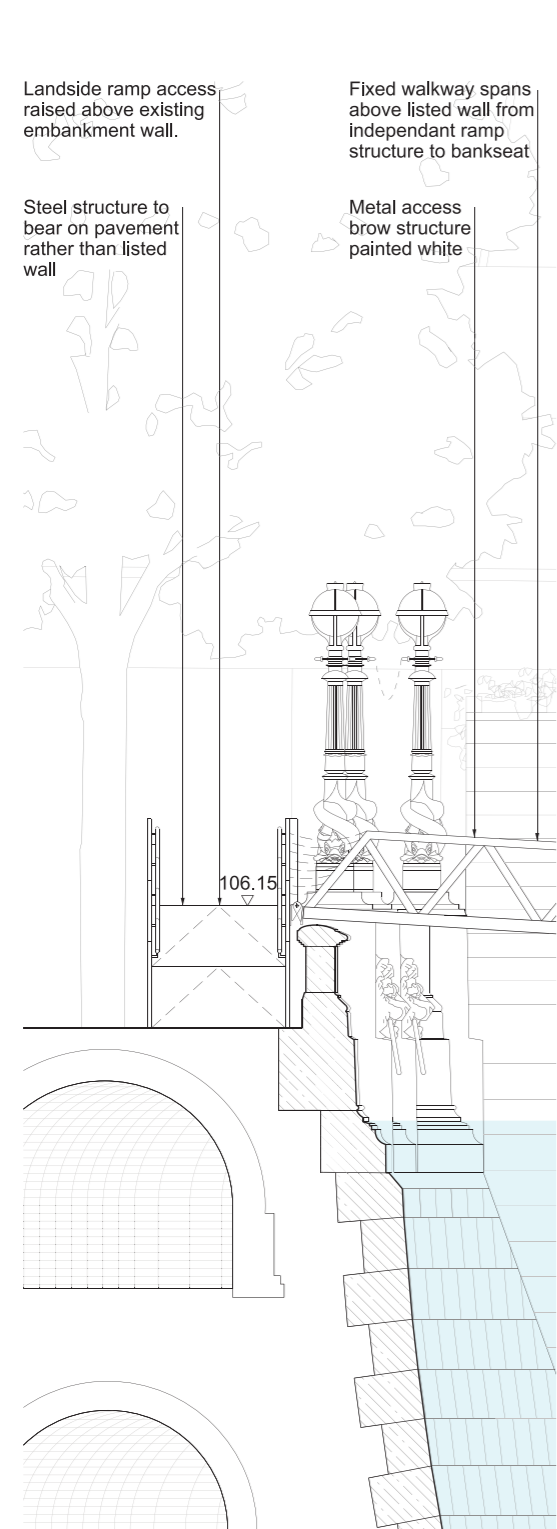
Proposed mooring access details - refer to Proposed mooring access details in the *Book of Plans
